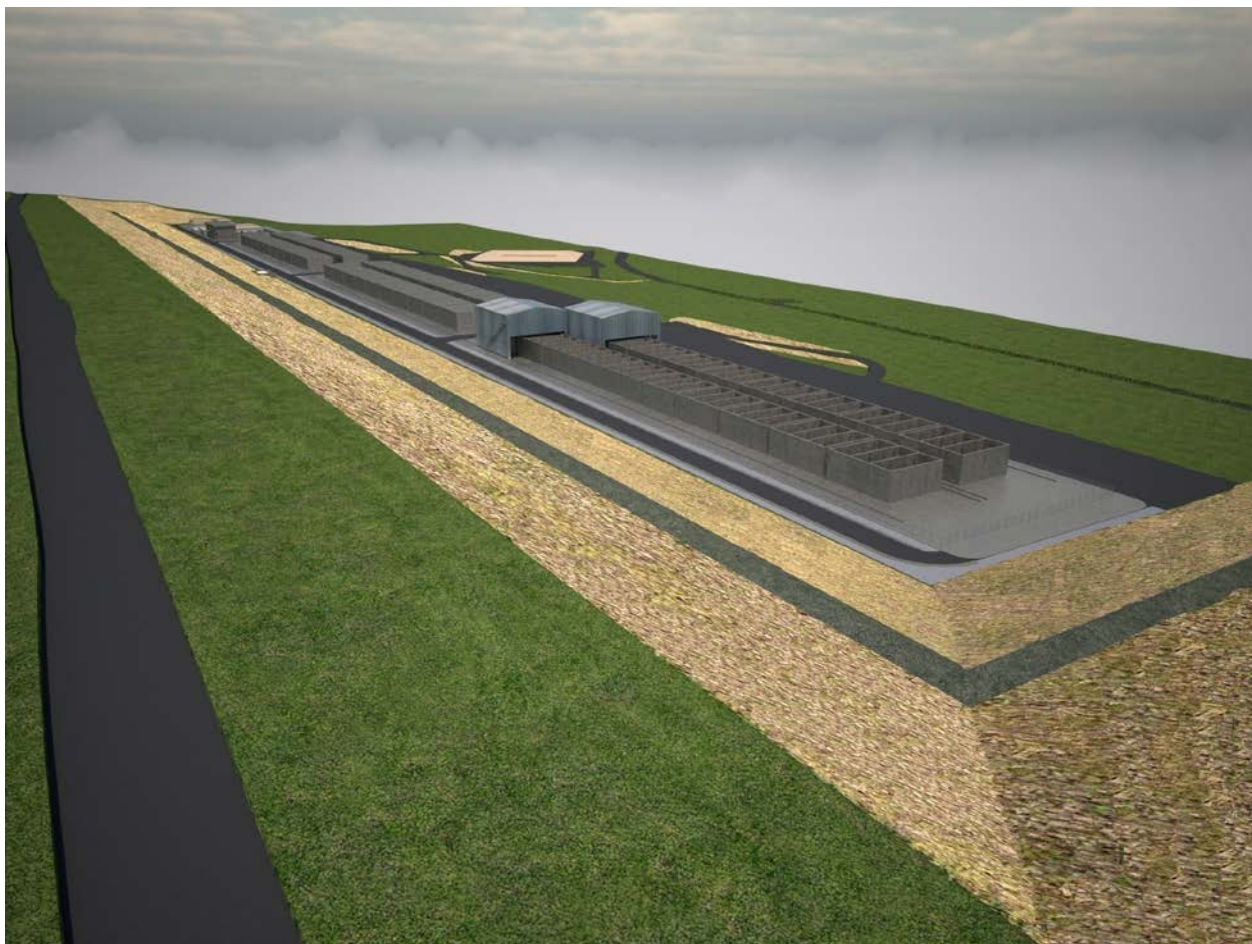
EXTERIOR OF A TRENCH-TYPE NDF
